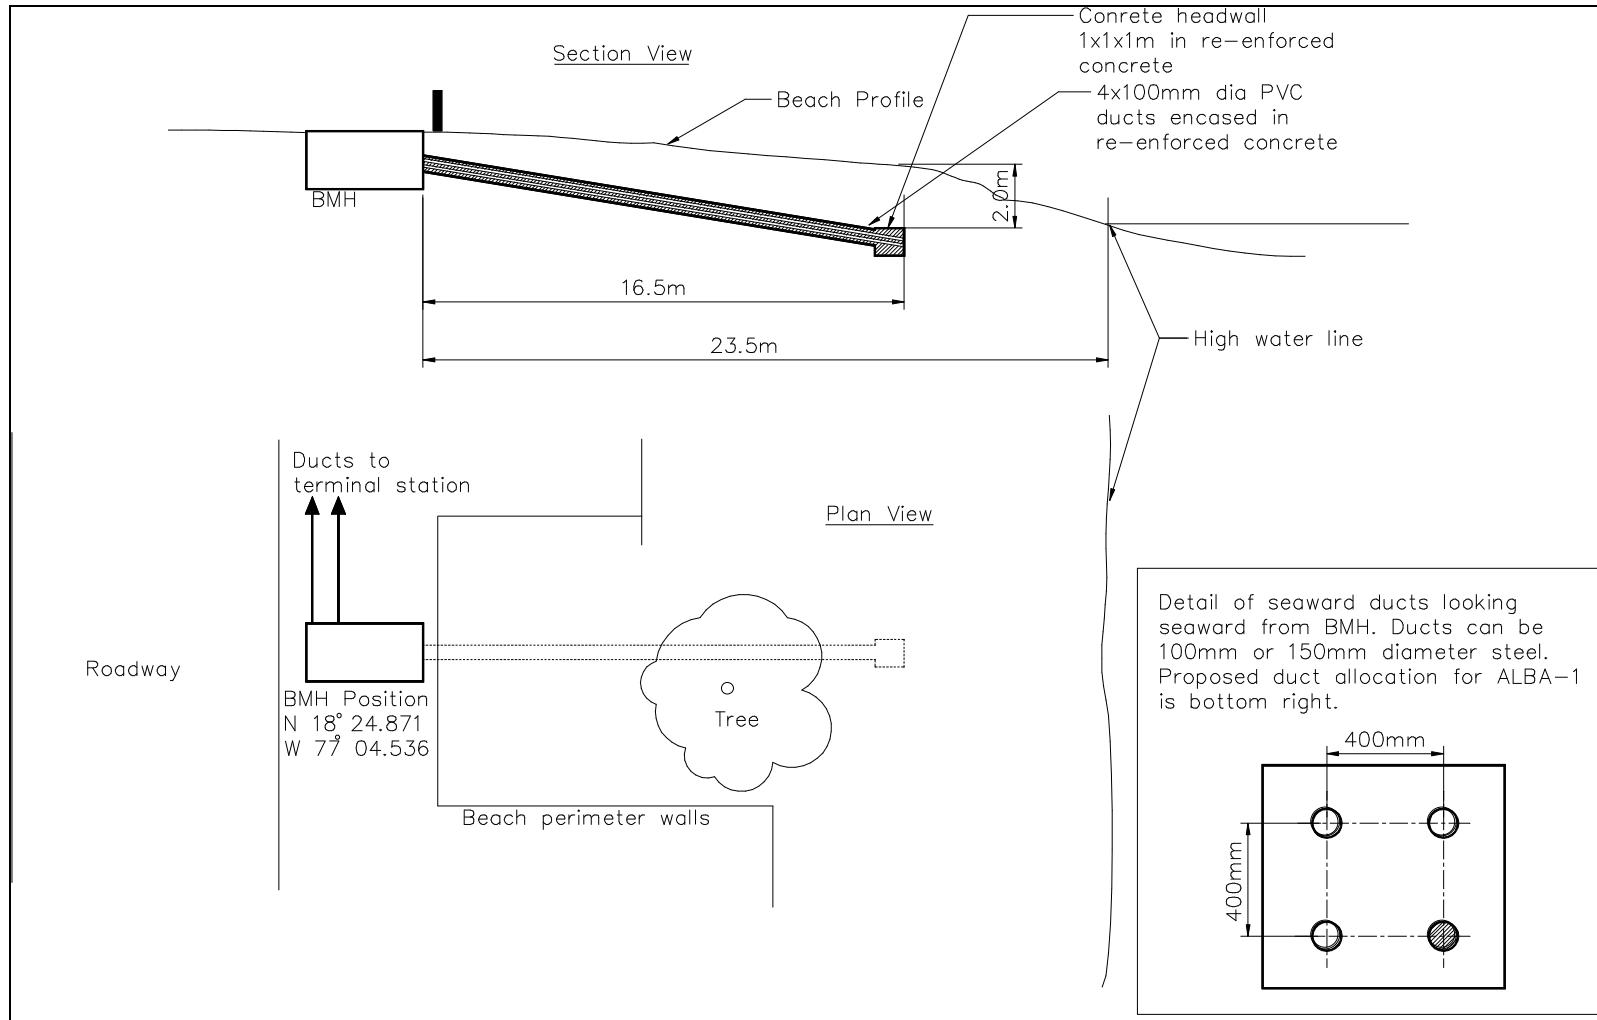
Proposed arrangement from the seaward ducts from beach manhole
